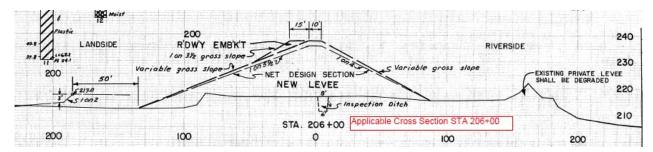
Levee Design Cross-Section from USACE (Drawing 1) Serial No. 16362
